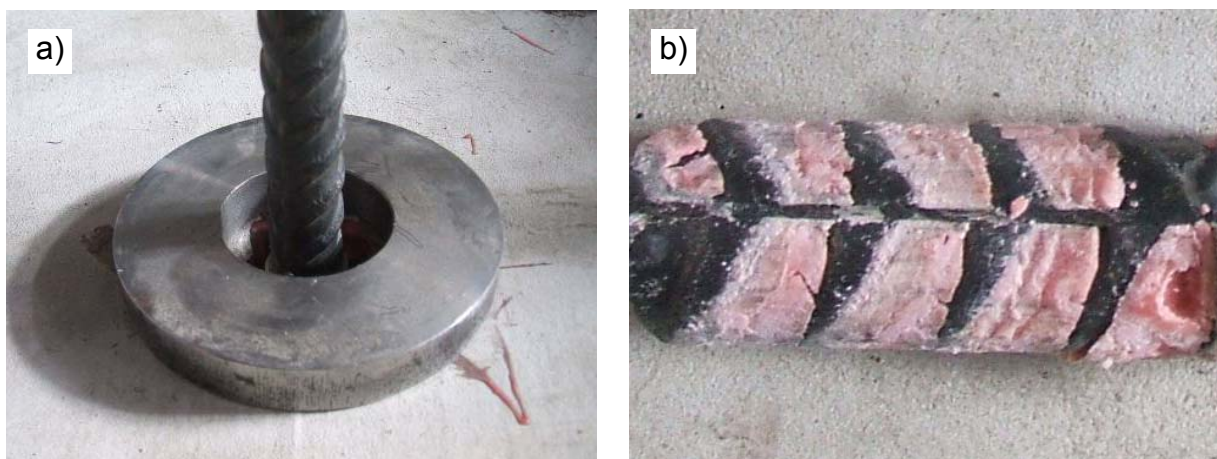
Close up of a) bearing plate for confined test setup and b) pulled out reinforcing bar (post-installed, as an example)
